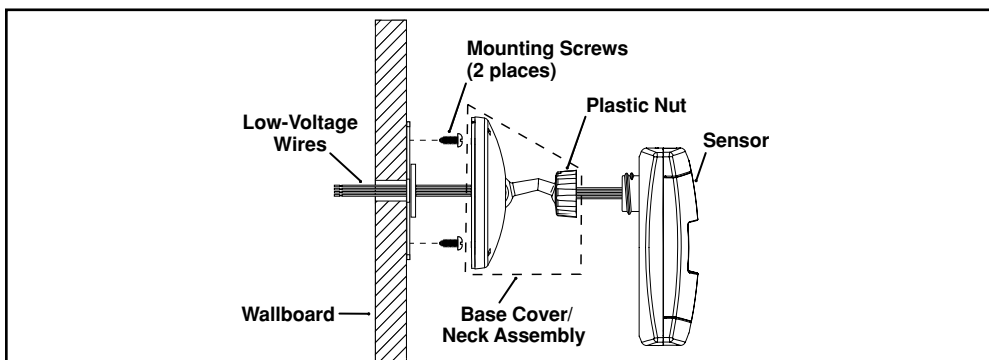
SMC-W WALL MOUNT INSTALLATION
